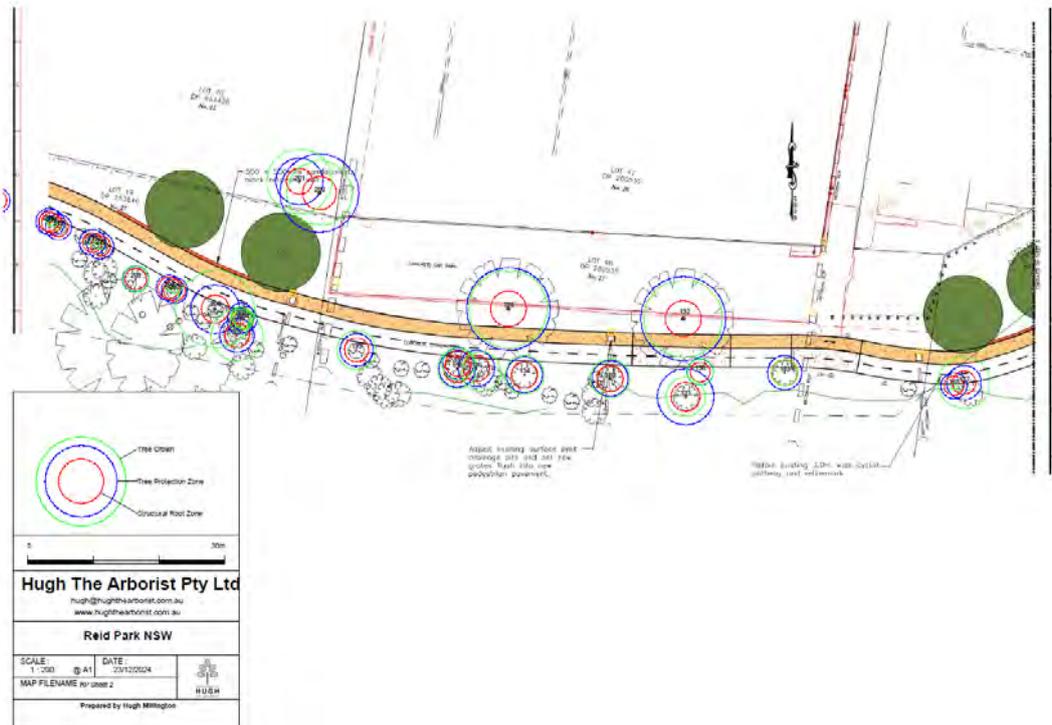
Site Plan (Sheet 2). Source: Hugh the Arborist
